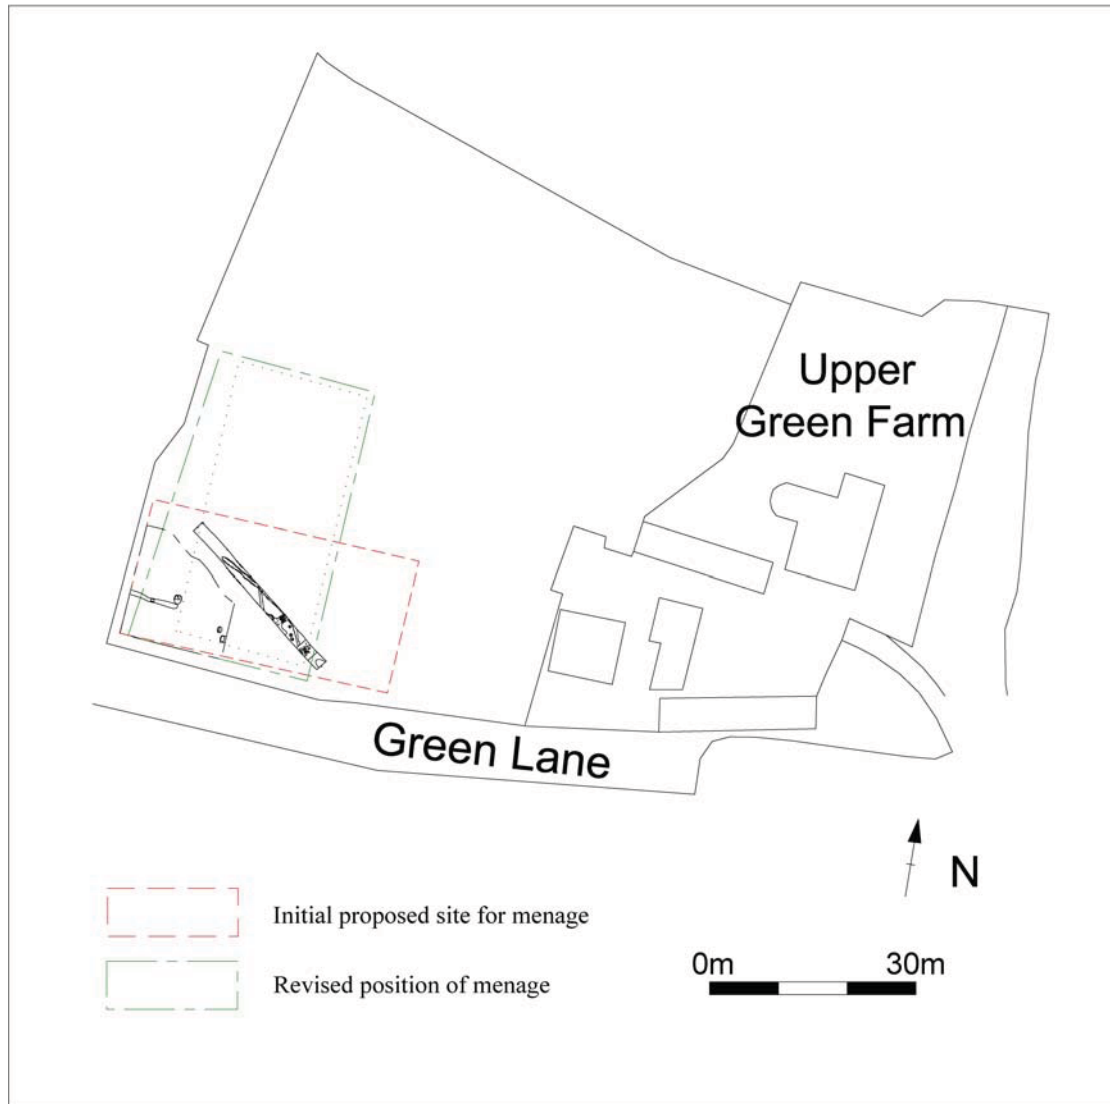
Site plan showing evaluation trench and adjustment of ménage layout.
